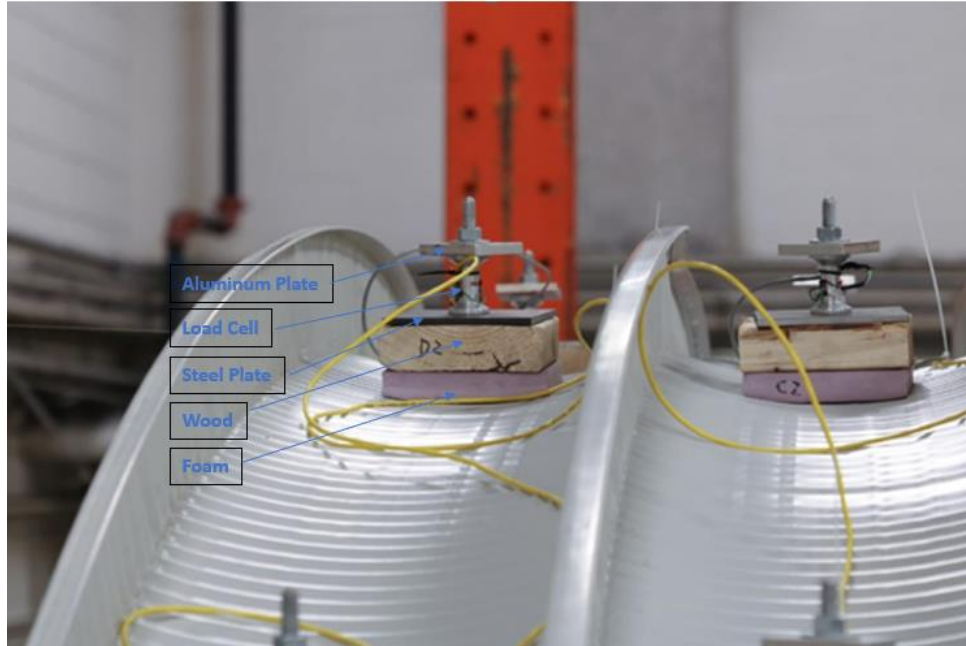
Loading Assembly and Loadcells Top of Specimens
